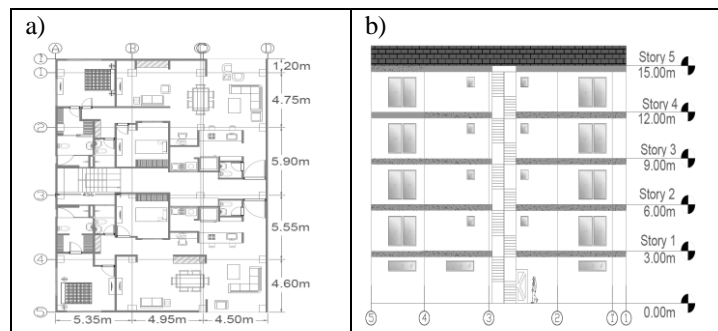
Dimensions of the design structure a) plan view and b) front view.
